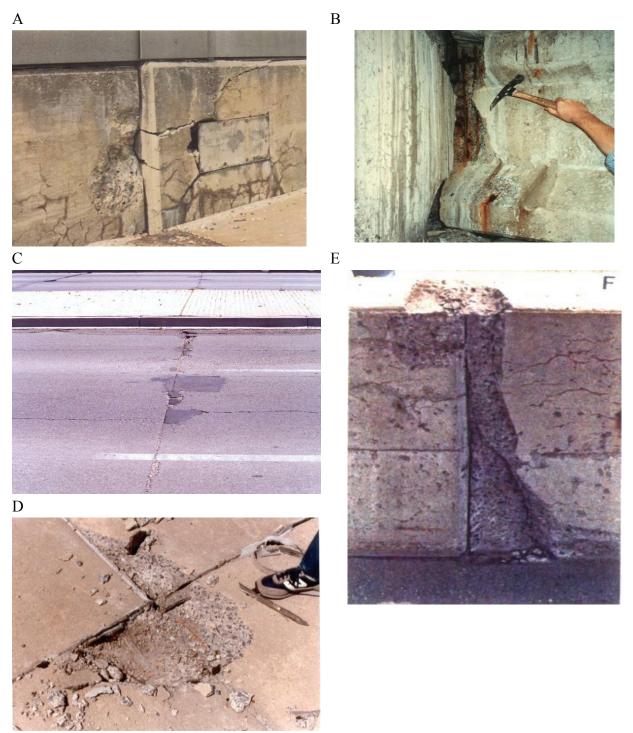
(A). Relative movement of abutting sections of parapet wall in a bridge structure affected by ASR (Stark 1991). (B). Expansion of bridge girder leading to loss of clearance between the girder and embankment and eventually crushing of the girder end with localized spalling. (C). Expansion causing spalling at joints in a concrete pavement incorporating a highly-reactive aggregate. (D). Expansion causing spalling at joints and extrusion of sealant material in a concrete pavement incorporating a highly reactive aggregate. (E). Expansion with associated severe spalling in abutting jersey barrier sections affected by ASR.
